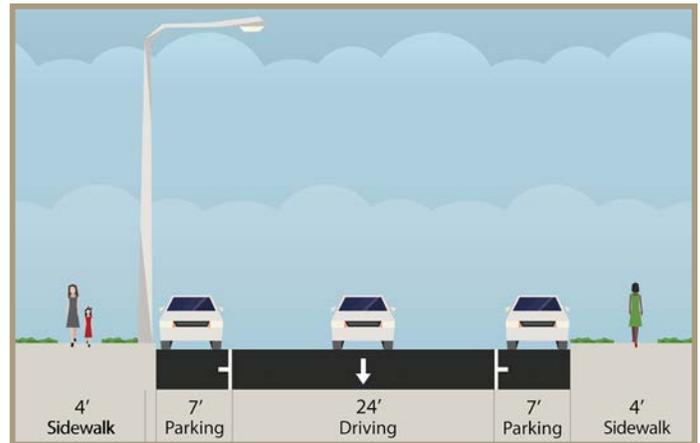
Looking east on Second Avenue west of the Lincoln Public School, existing conditions.
